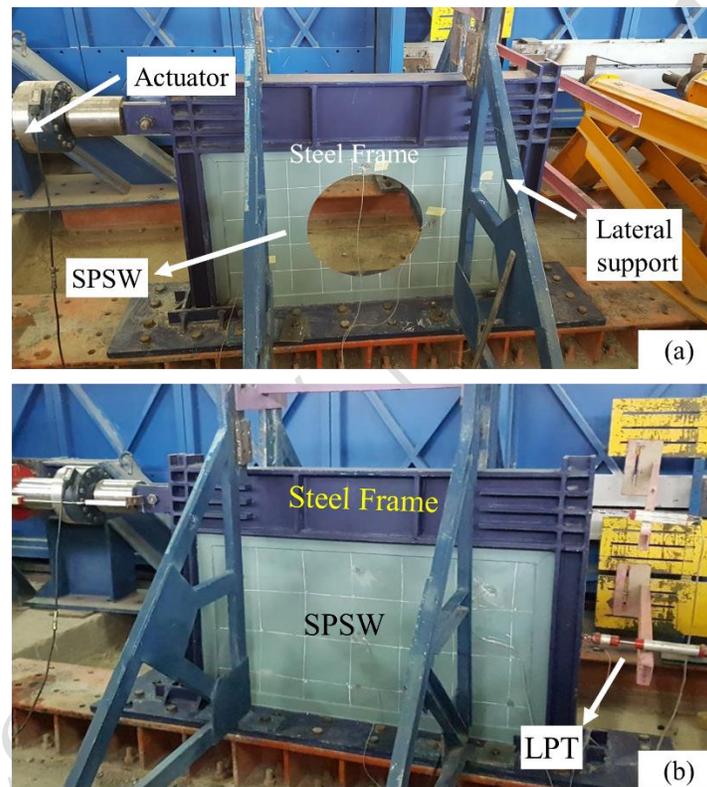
Steel plate shear wall in the lab (a) with an opening and (b) without opening.
